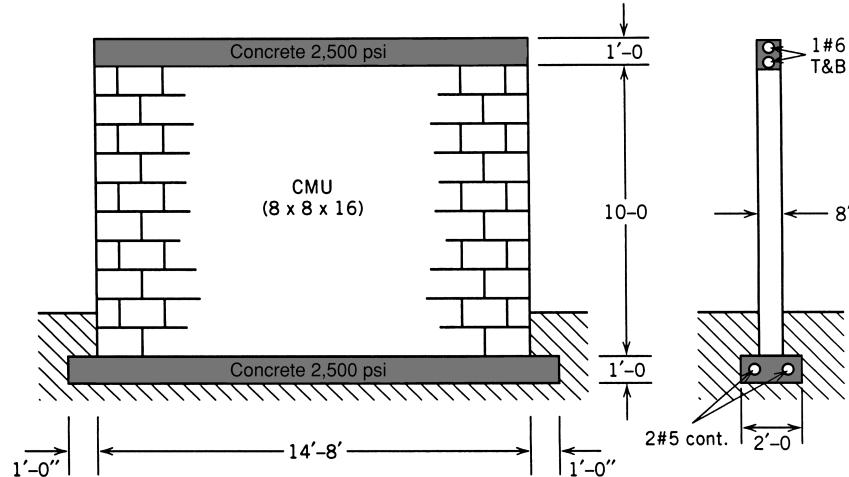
Small wall construction (CMU = concrete masonry unit).
